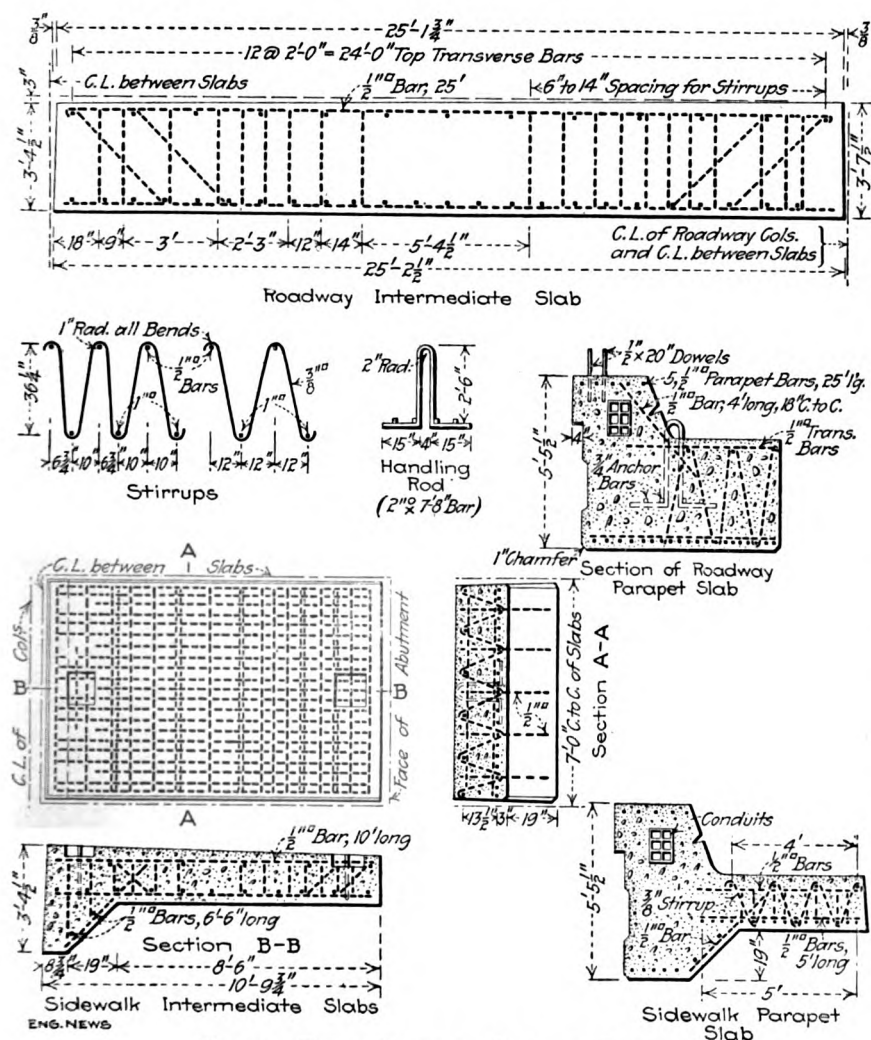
DECK SLABS OF SUBWAY BRIDGES
